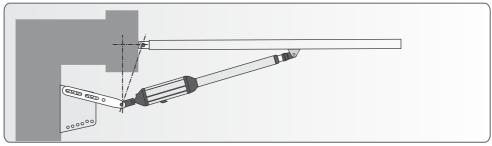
INSTALLATION ON AN ANGLED WALL
